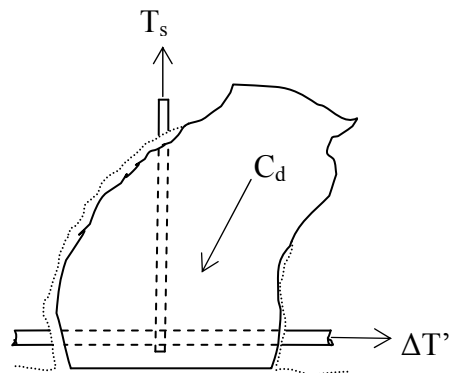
6: Forces between diagonal cracks (beams with stirrups) (Park and Paulay 1975)
